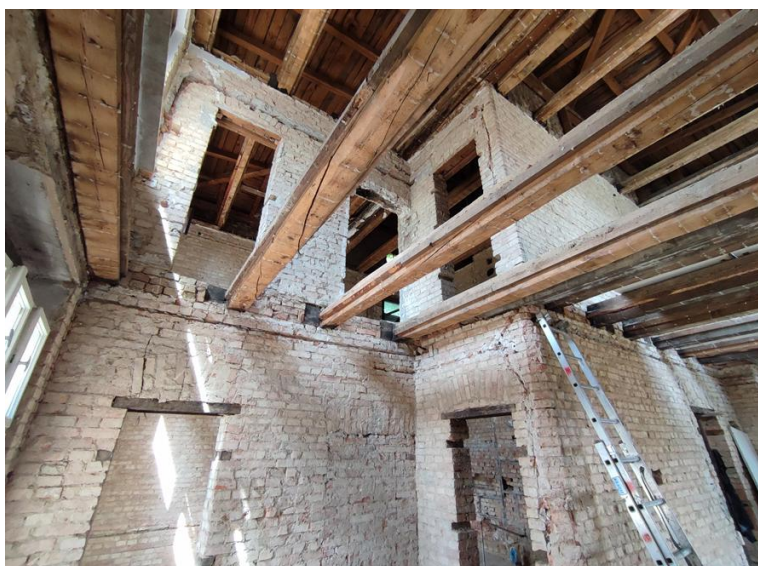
View of the existing condition of the floor beams and load-bearing walls.
